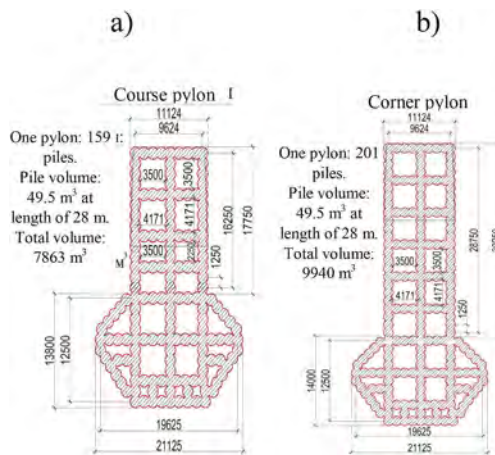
Construction of pile foundations for roof supports: a - course pylon; b - corner pylon.
